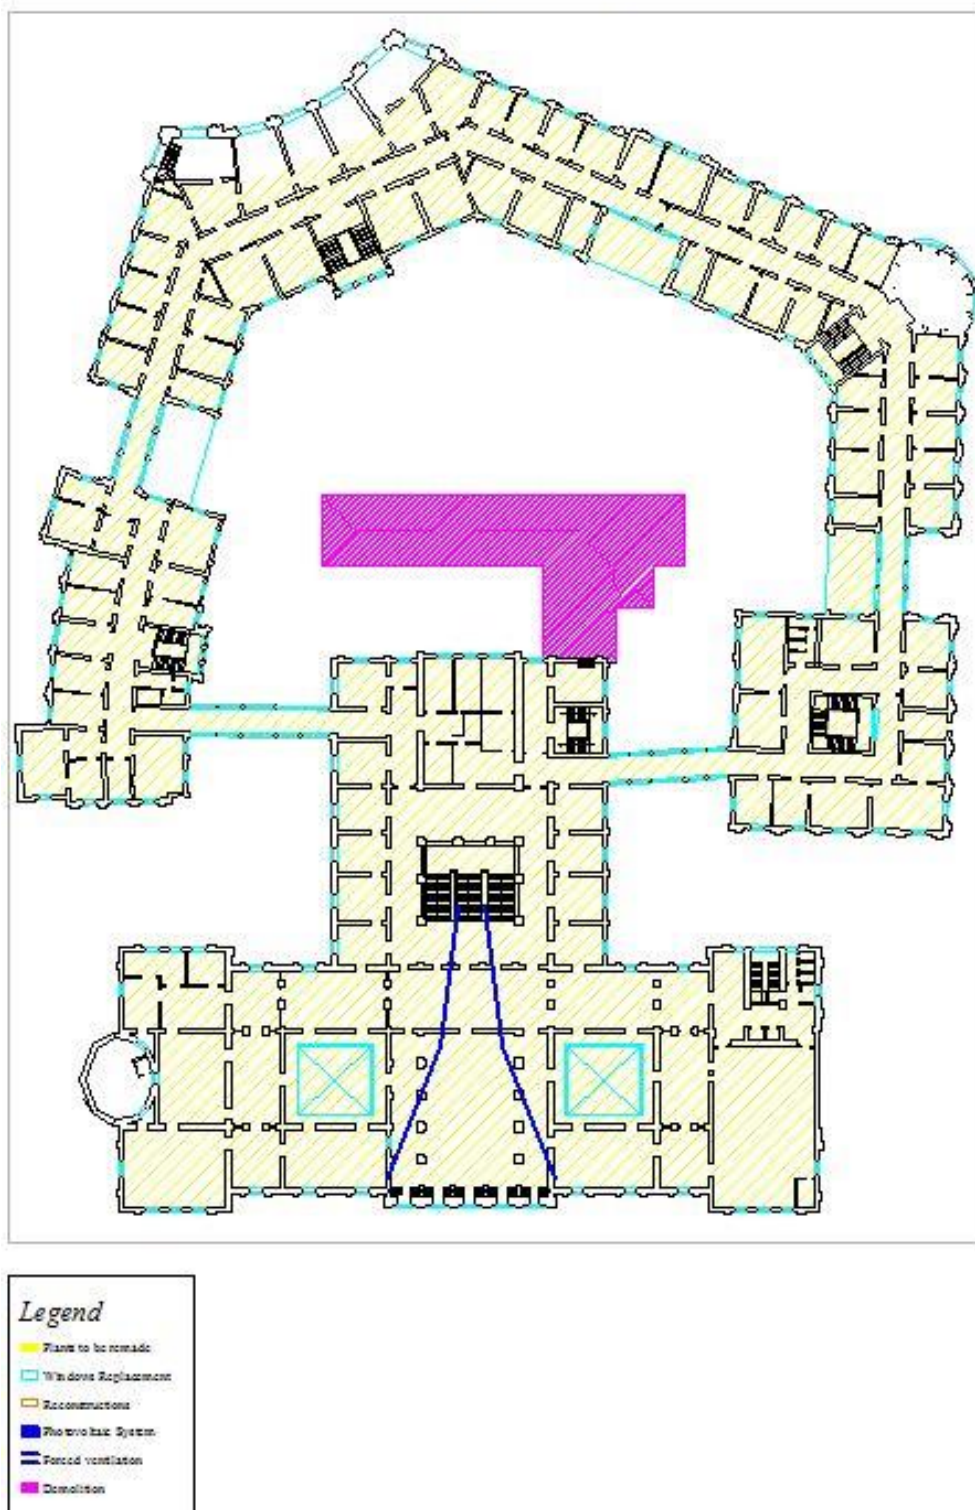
FIRST FLOOR BUILDING DESIGN
